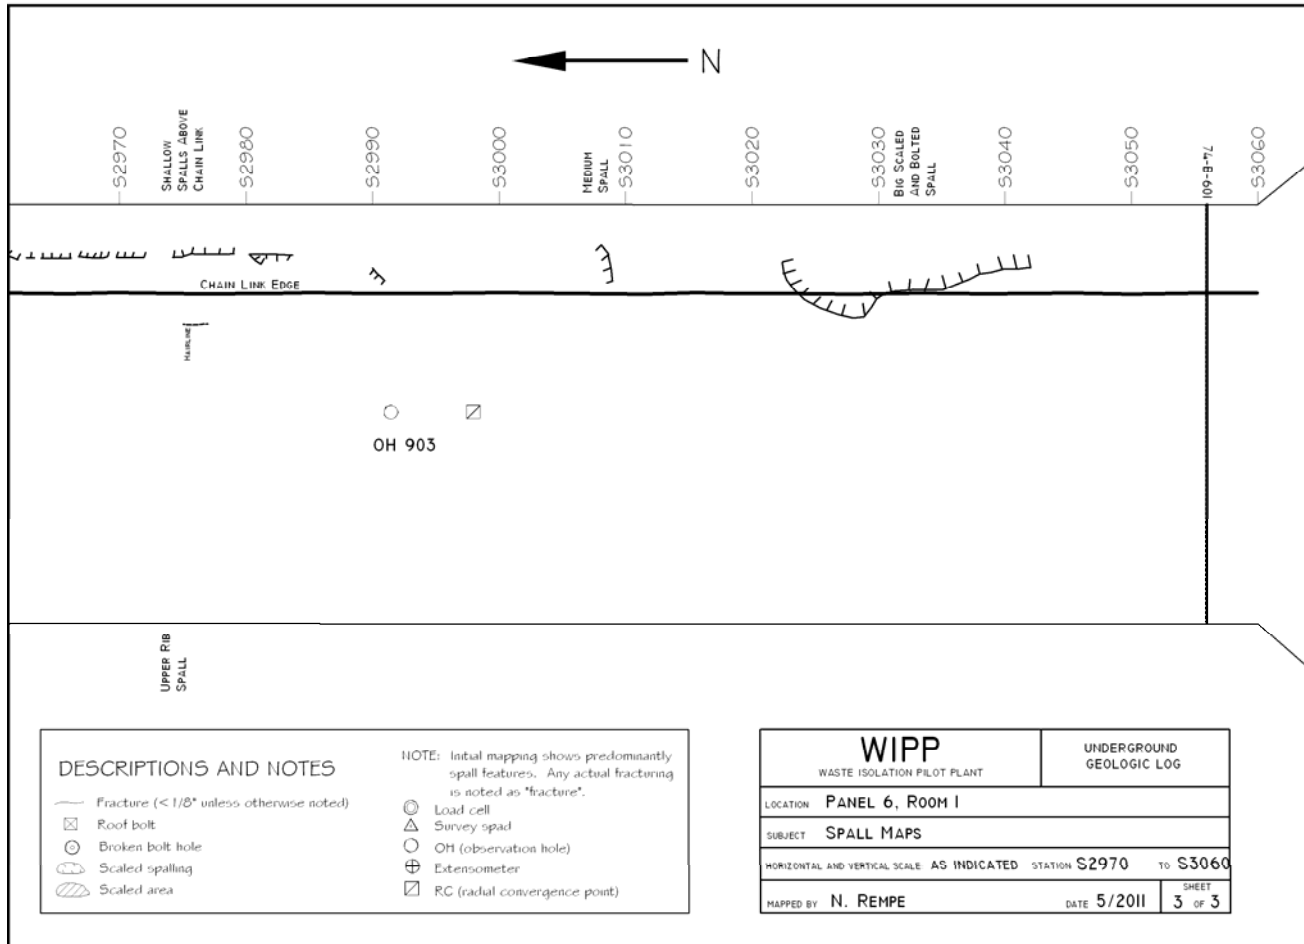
Panel 6 Room 1, S2770-S3060 Roof Fractures (Sheet 3 of 3)
